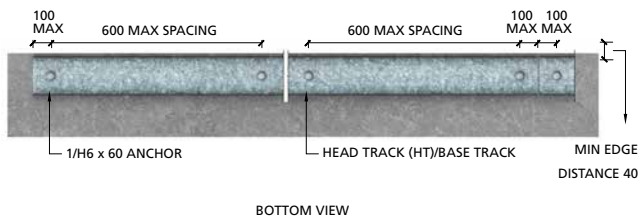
(A)a: TRACK FIXING TO CONCRETE SUBSTRATE (TRACK WIDTH 51,64,76 AND 92mm)
